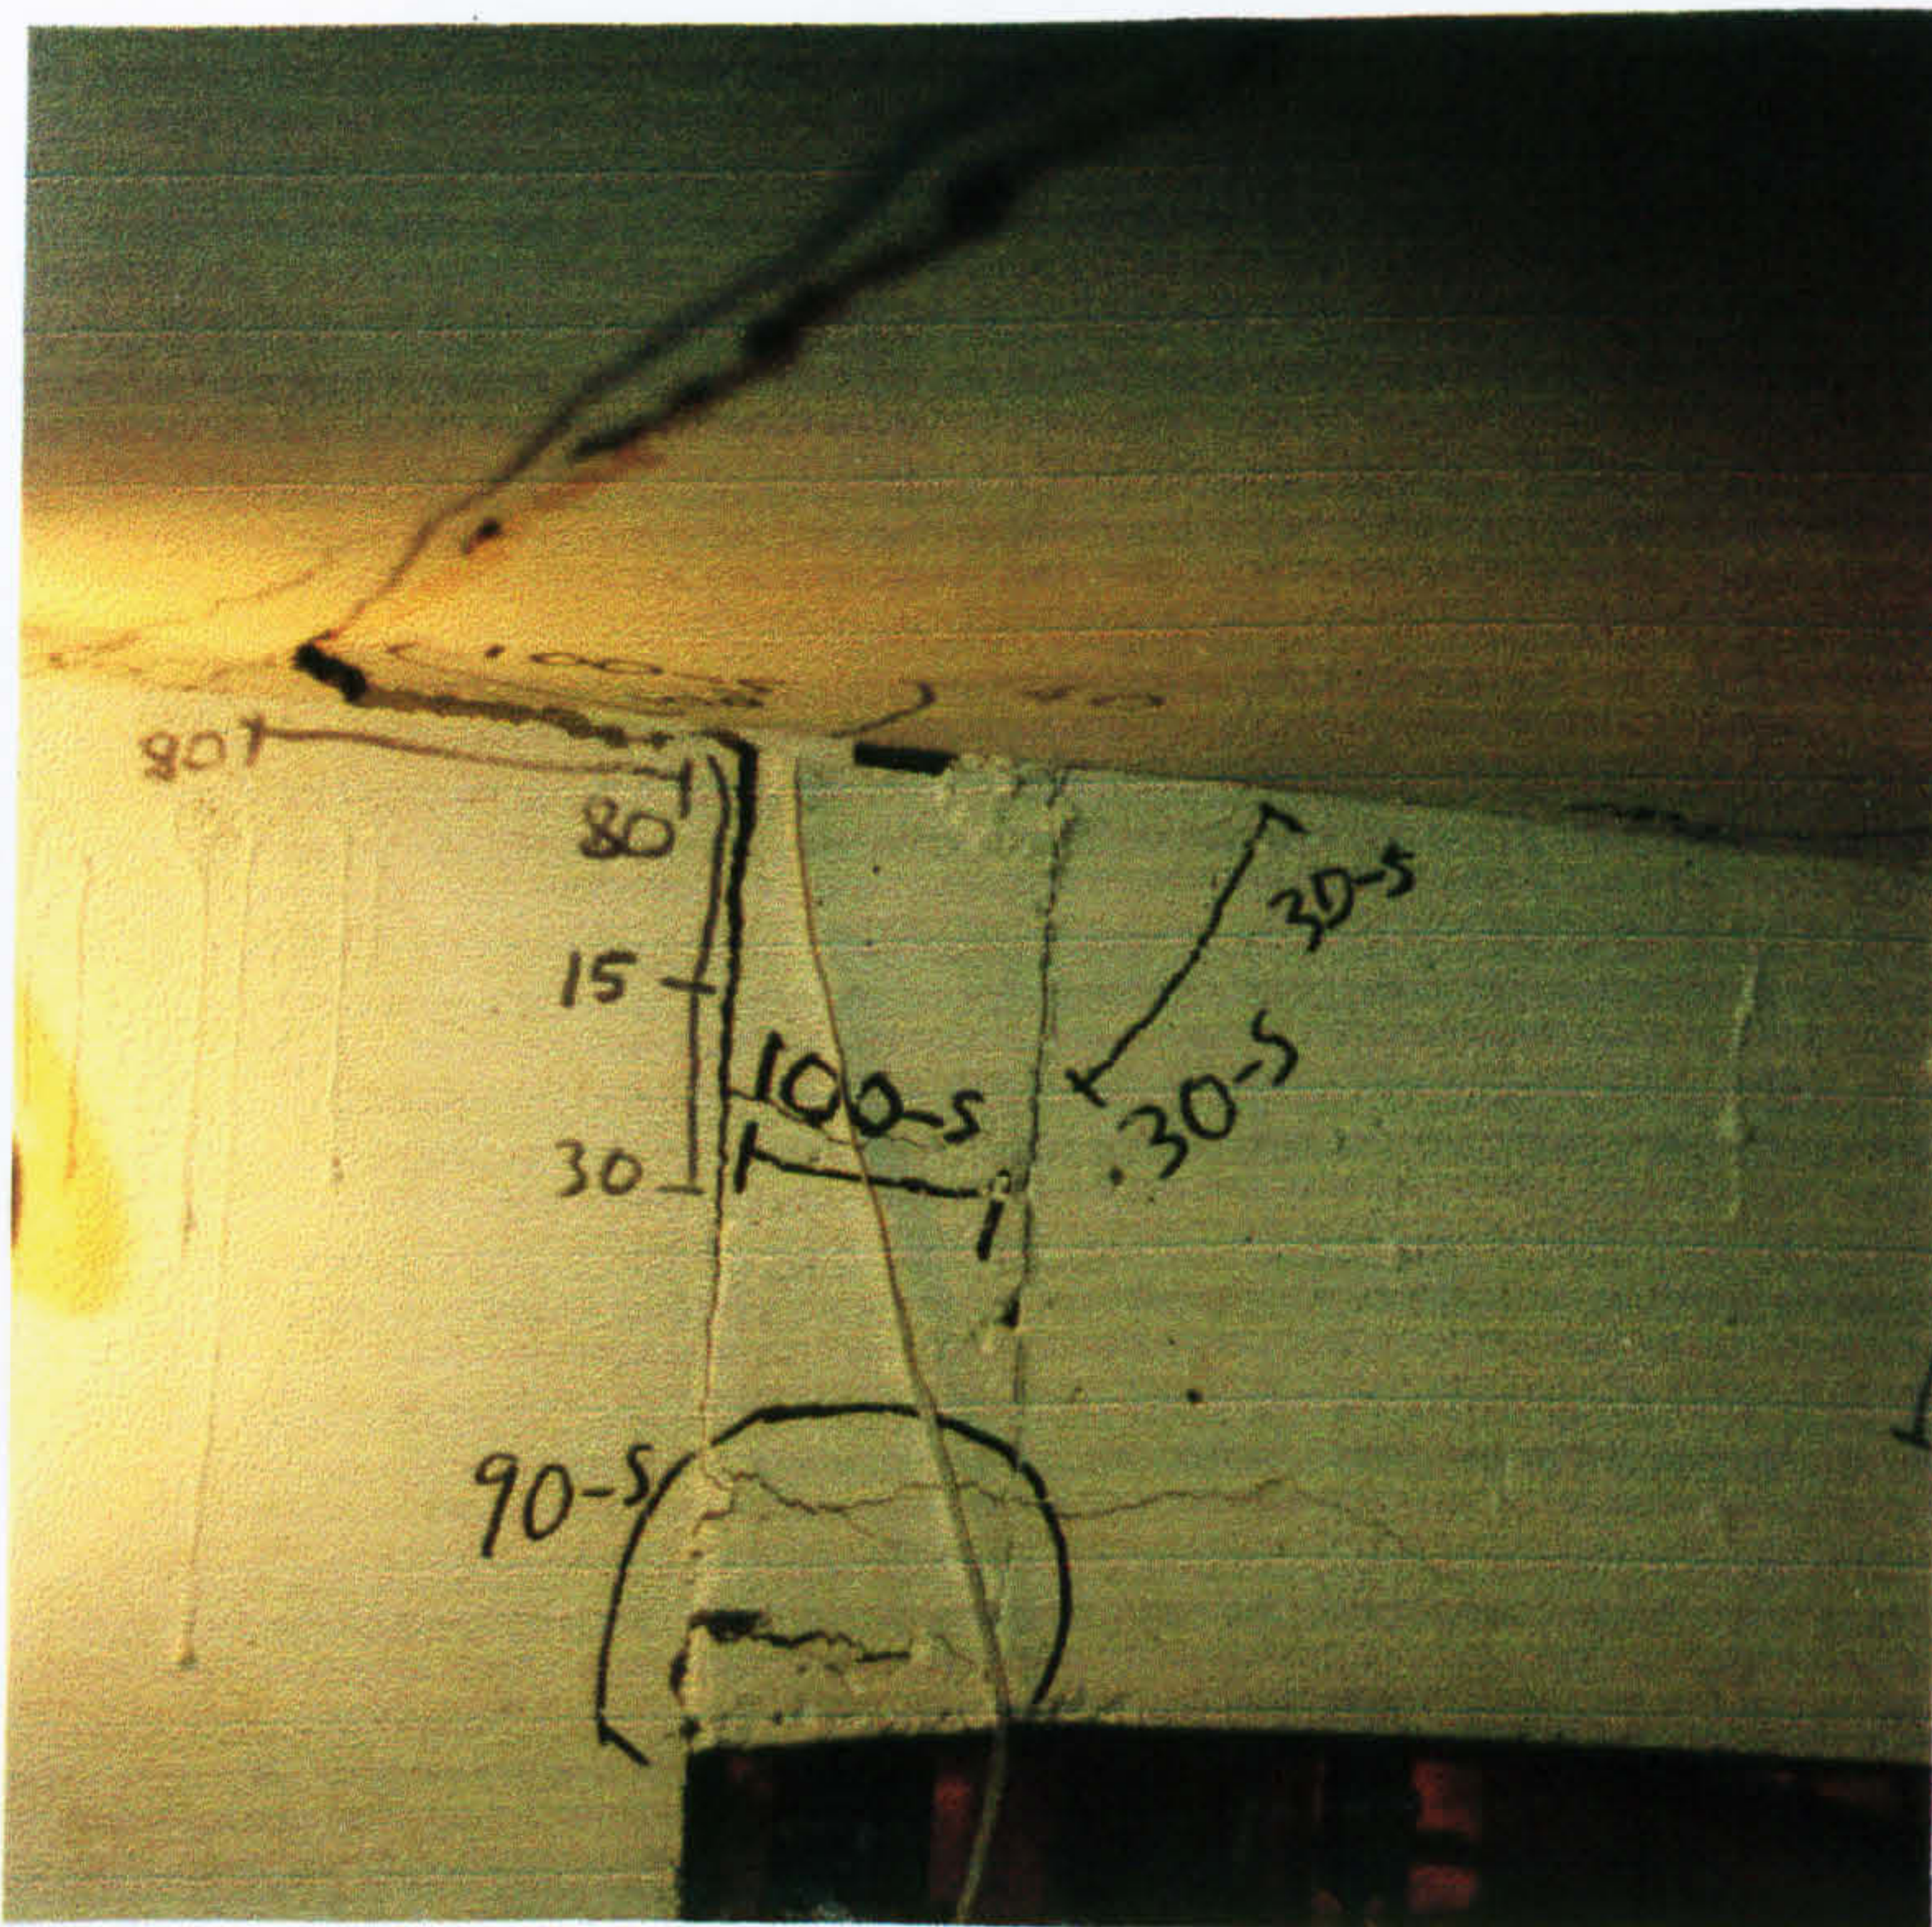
Failure region of beam 2-column joint from West in TW1(A)
